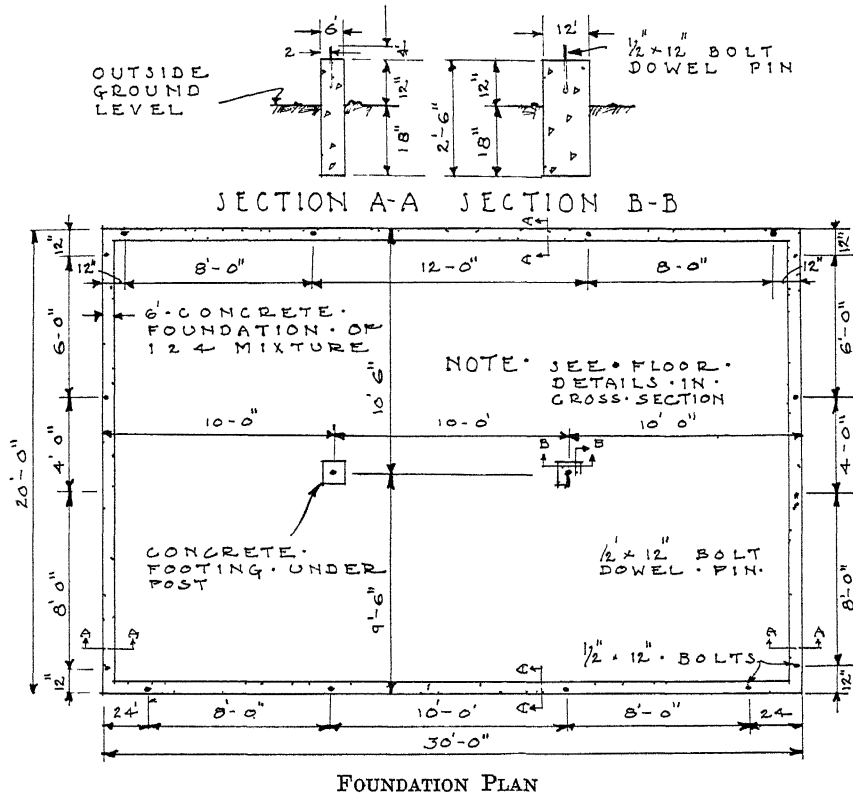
The foundation is a 6-inch concrete wall made of one part portland cement, two parts sand, and four parts coarse gravel or crushed stone. The sills are fastened to the foundation by $\frac{1}{2}$ " \times 12" carriage bolts set two inches from the outer edge of the wall and spaced to miss the studs.
